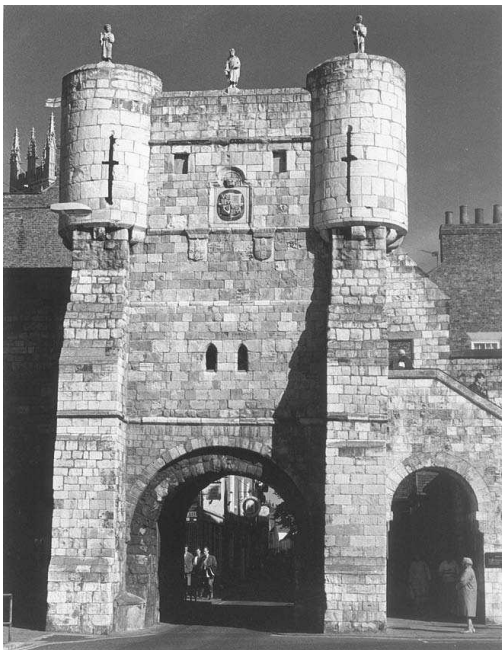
Bootham Bar, York: Mediaeval limestone masonry, largely built as two skins of dressed stone with a core of rubble and mortar. Being originally built as a fortification, the heavy construction of this gate-tower has ensured that it is still intact despite the quite severe weathering of the surface.
